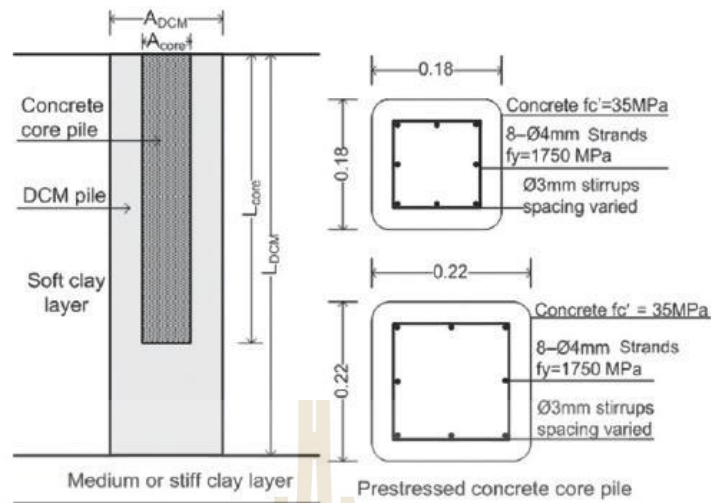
(a) Schematic diagram of SDCM pile; (b) details of prestress concrete core piles (dimensions in m.).
